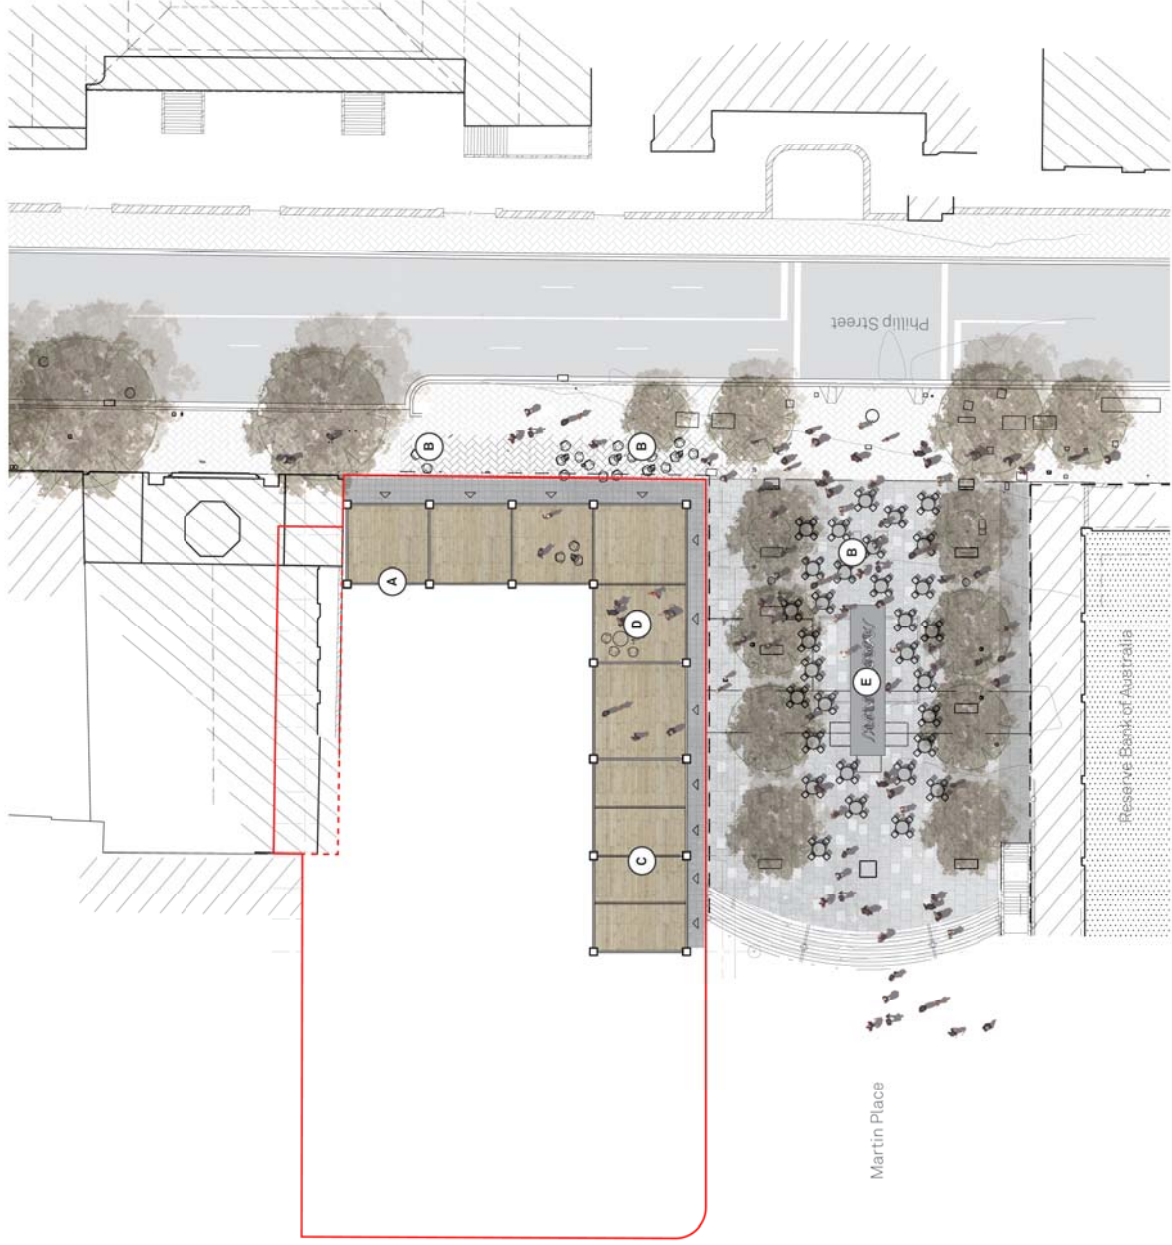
Upper Ground Level Plan, 1:500 scale @ A3
